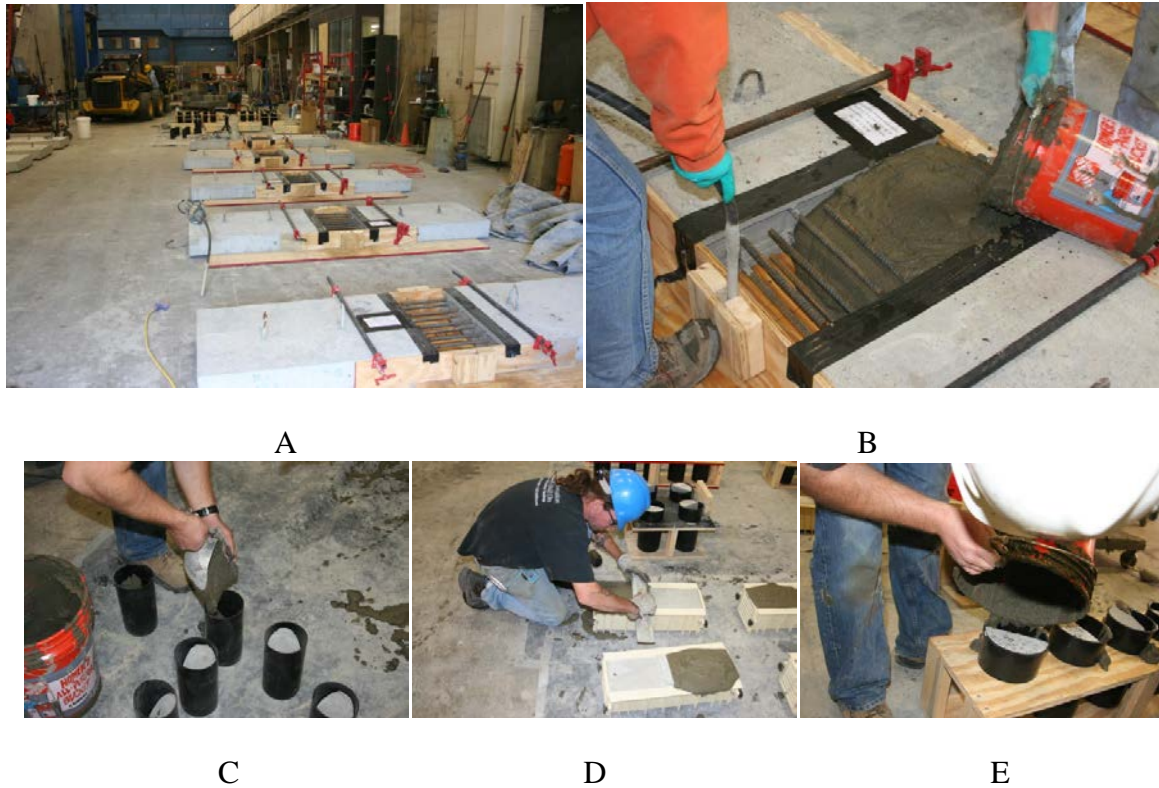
Casting the “grout half” of bond characterization specimens: A) deck-level connection specimens and bond characterization specimens to be casted; B) casting of non-shrink grout deck-level connection; C) slant shear specimens; D) flexural strength specimens; E) splitting tensile specimens.
